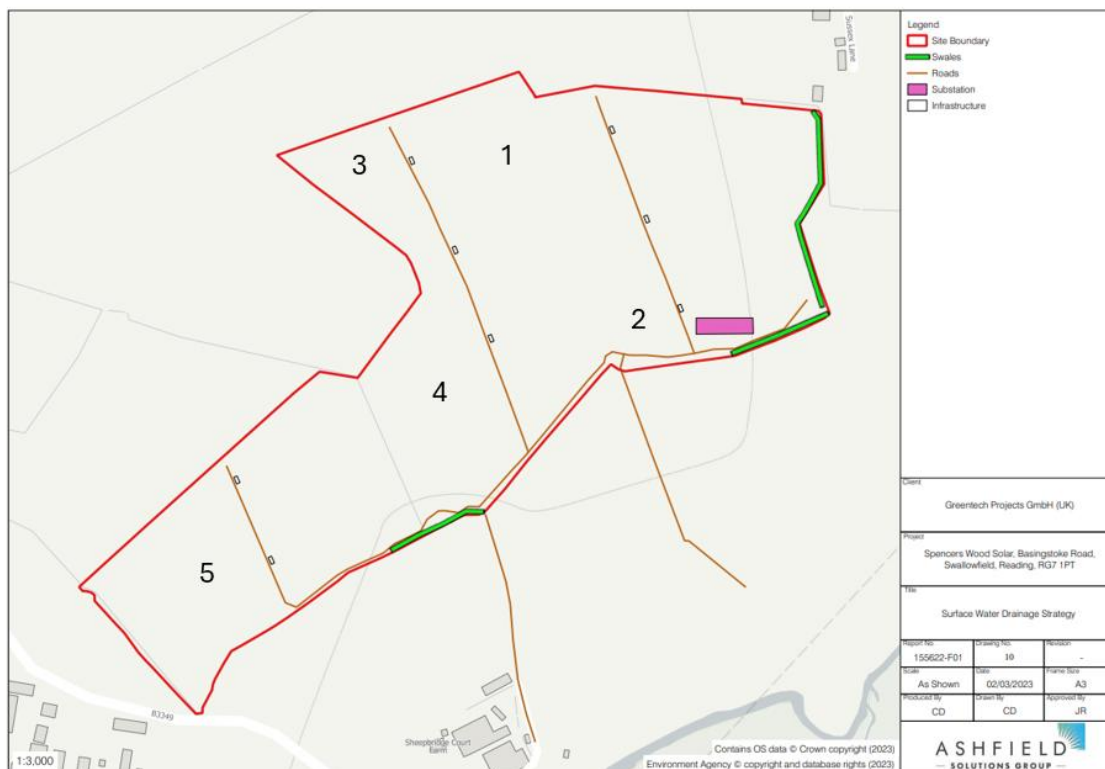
Plan 155622-F01 showing the location of proposed swales in green.
